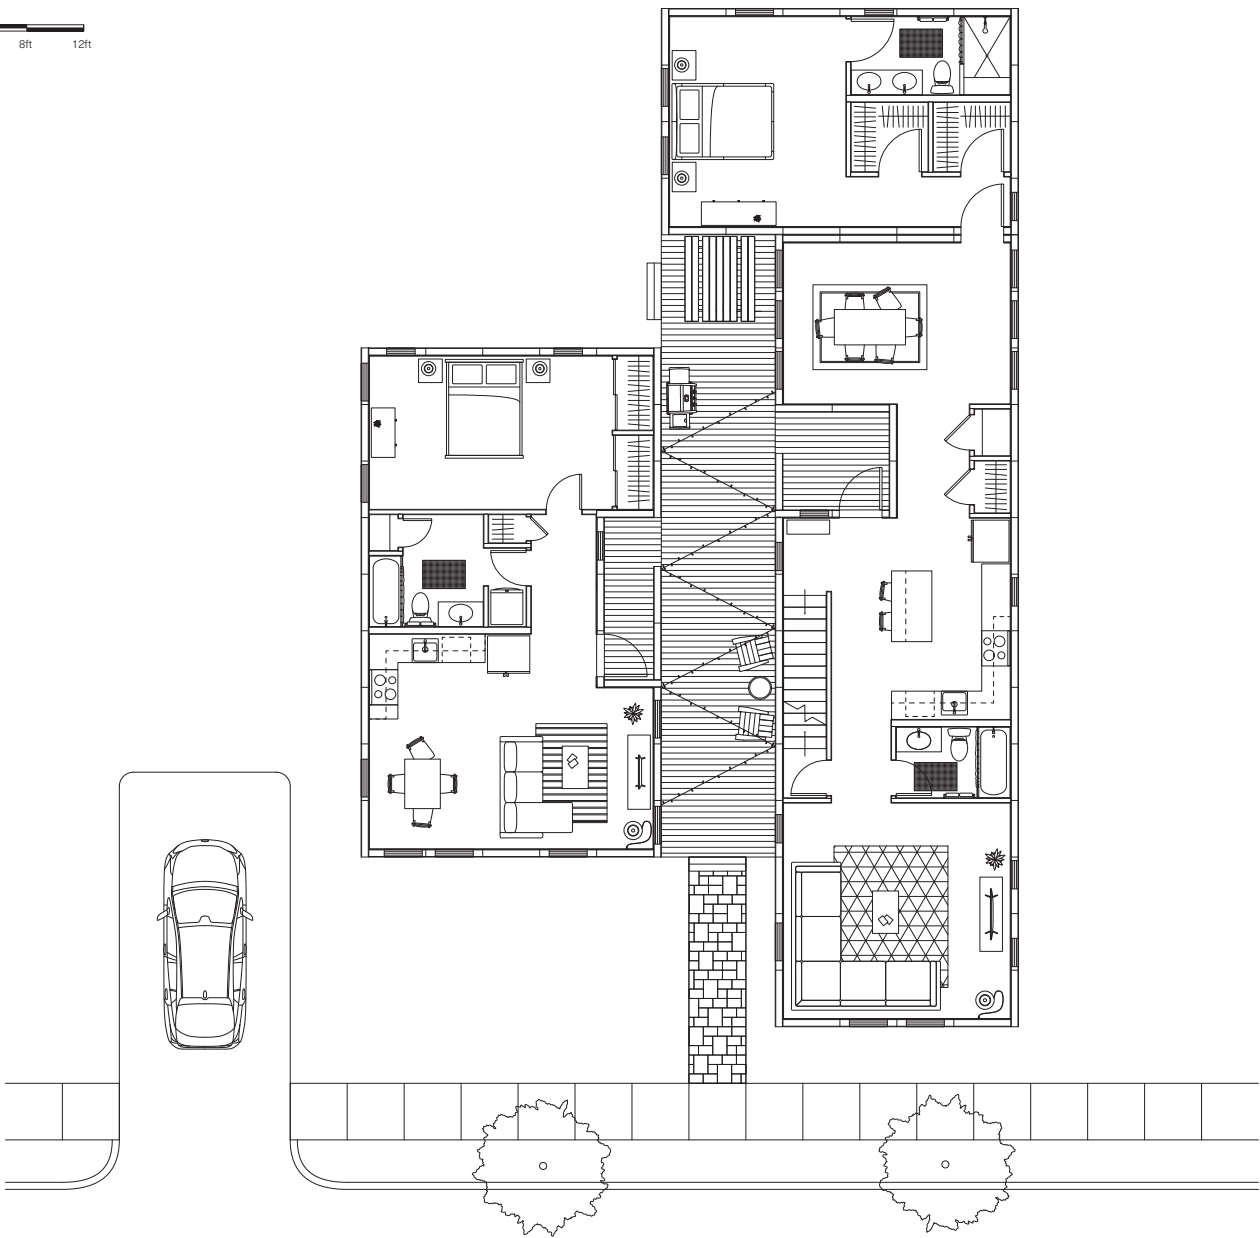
The Passage, Second Floor Plan, Fully Developed
